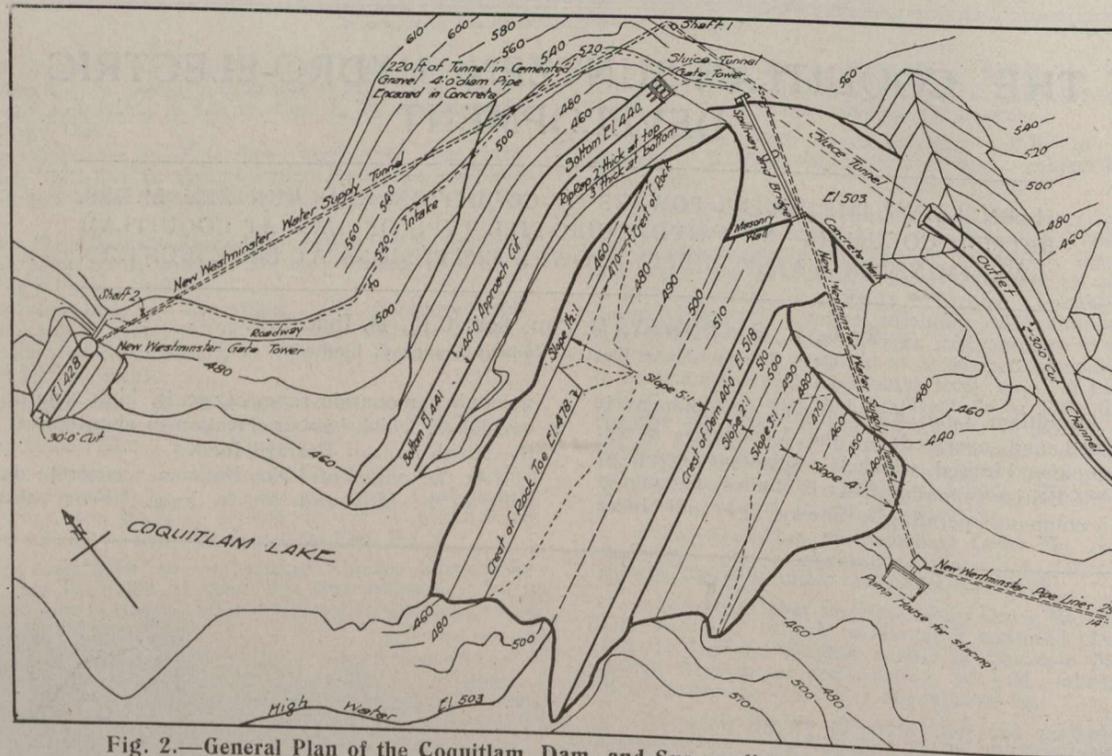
General Plan of the Coquitlam Dam, and Surrounding Development.
